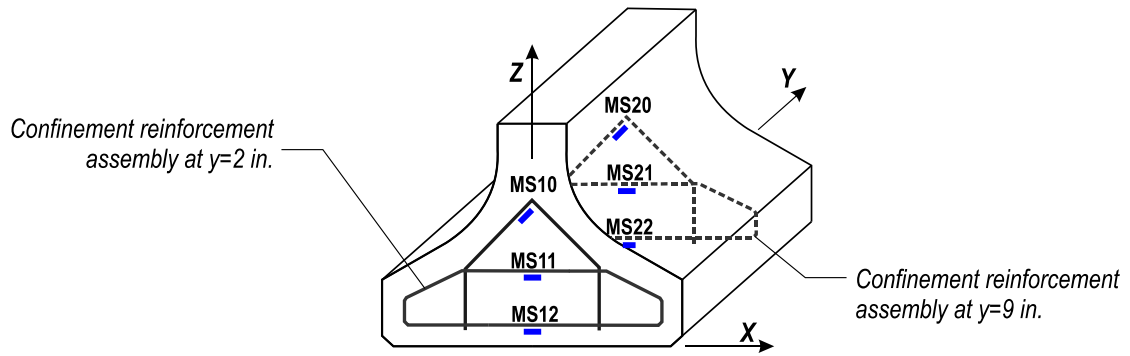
FB confinement reinforcement strain at 2 in. and 9 in. from end of girder
